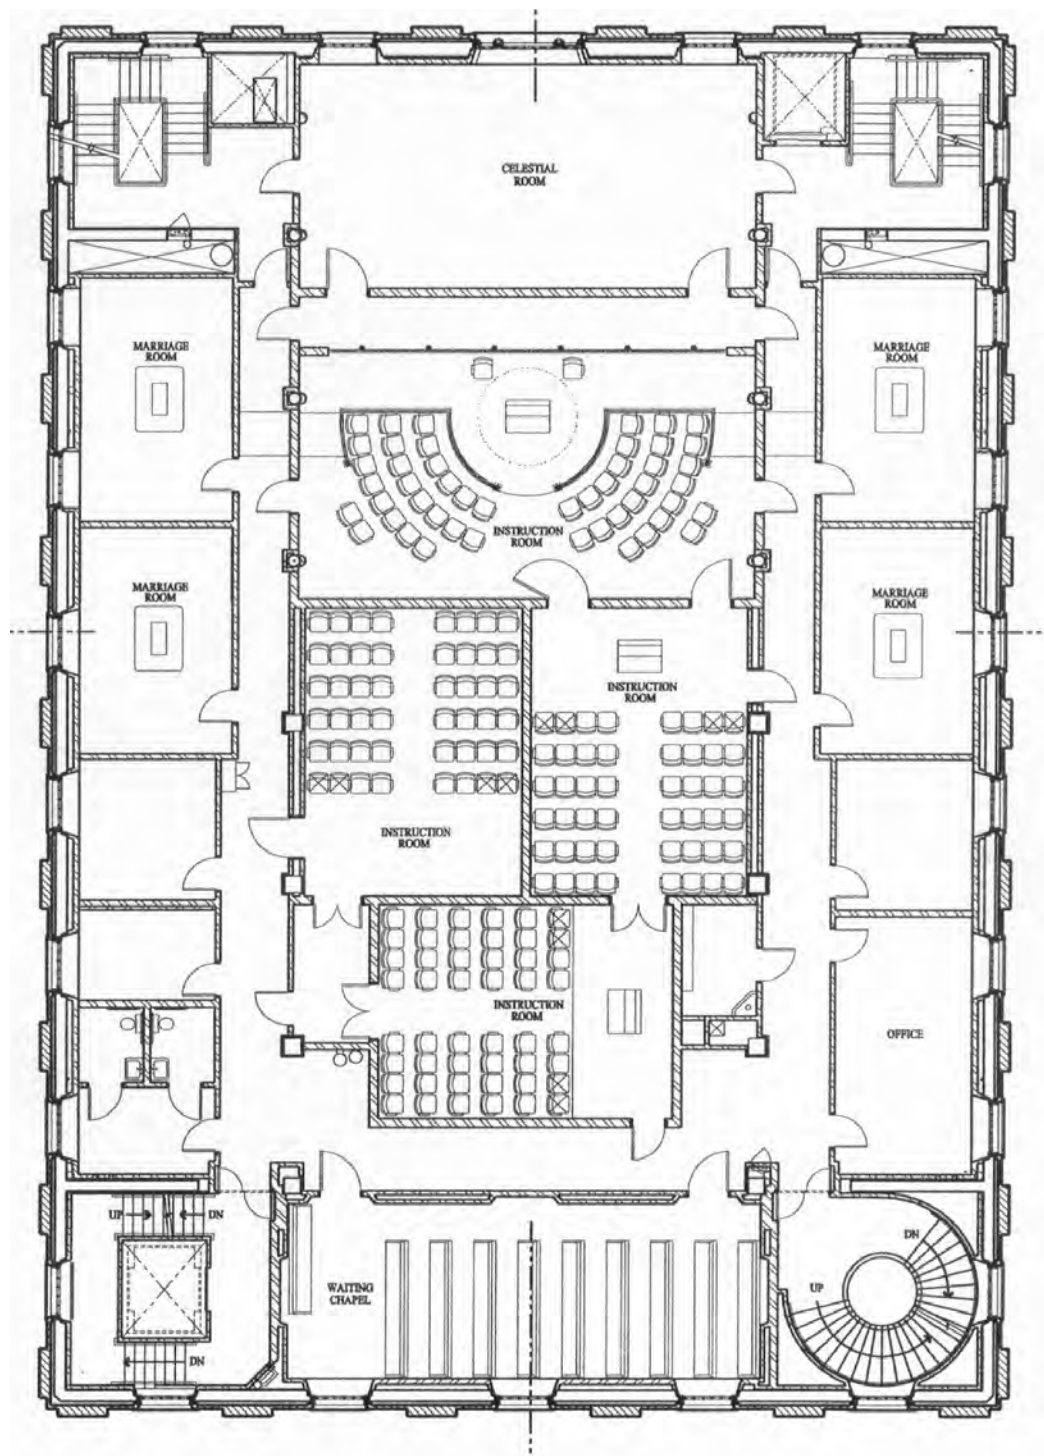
Second floor plan of the new Nauvoo temple. Compare with original plans of the main floor on Figure 7. Courtesy FFKR Architects.
